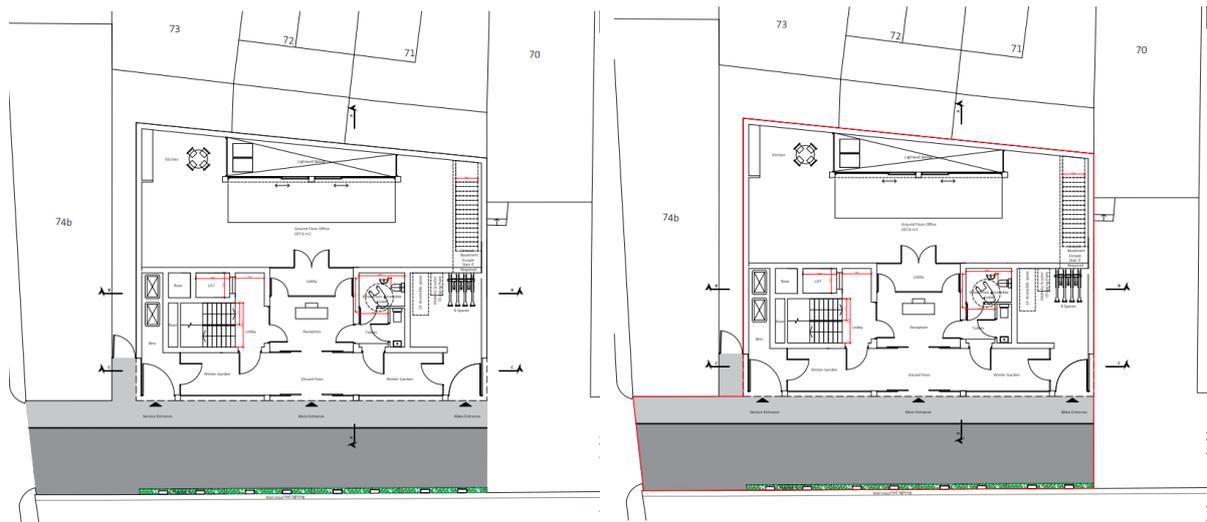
and 10: Proposed Ground Floor showing original (left) and revised (right) red line boundary
